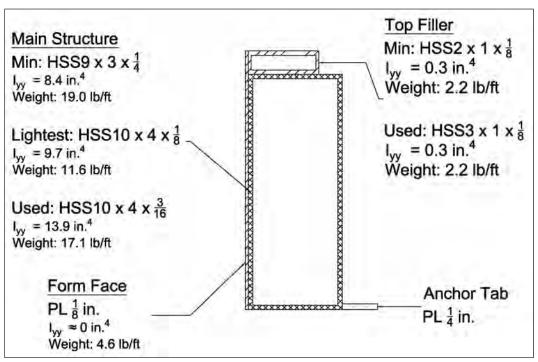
Modified formwork nominal cross-section requirements and prototype construction.
